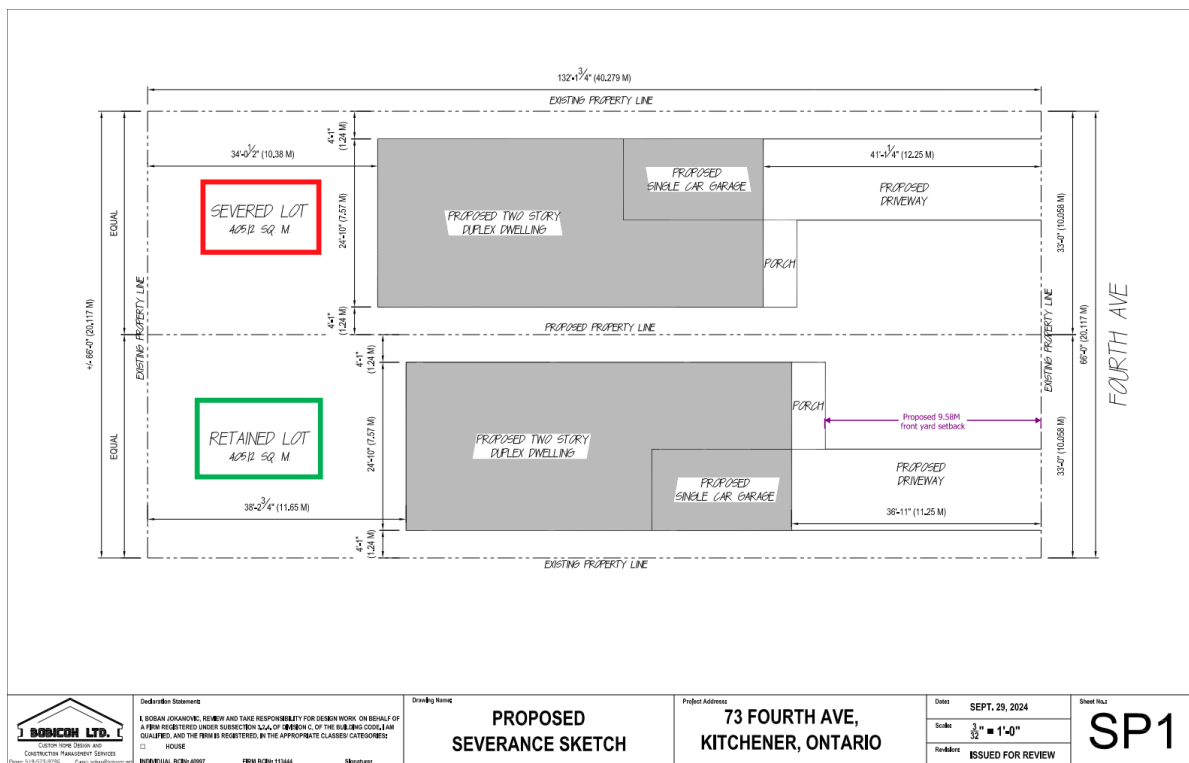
Proposed Severance Sketch and Reduced Front Yard Setback
